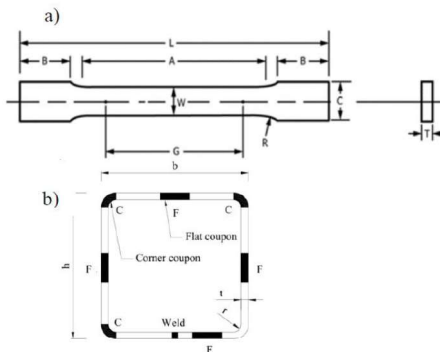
a) Nominal dimensions of monotonic and fatigue tests specimen standards b) Location of flat and curved coupon of hollow sections elements [12].
